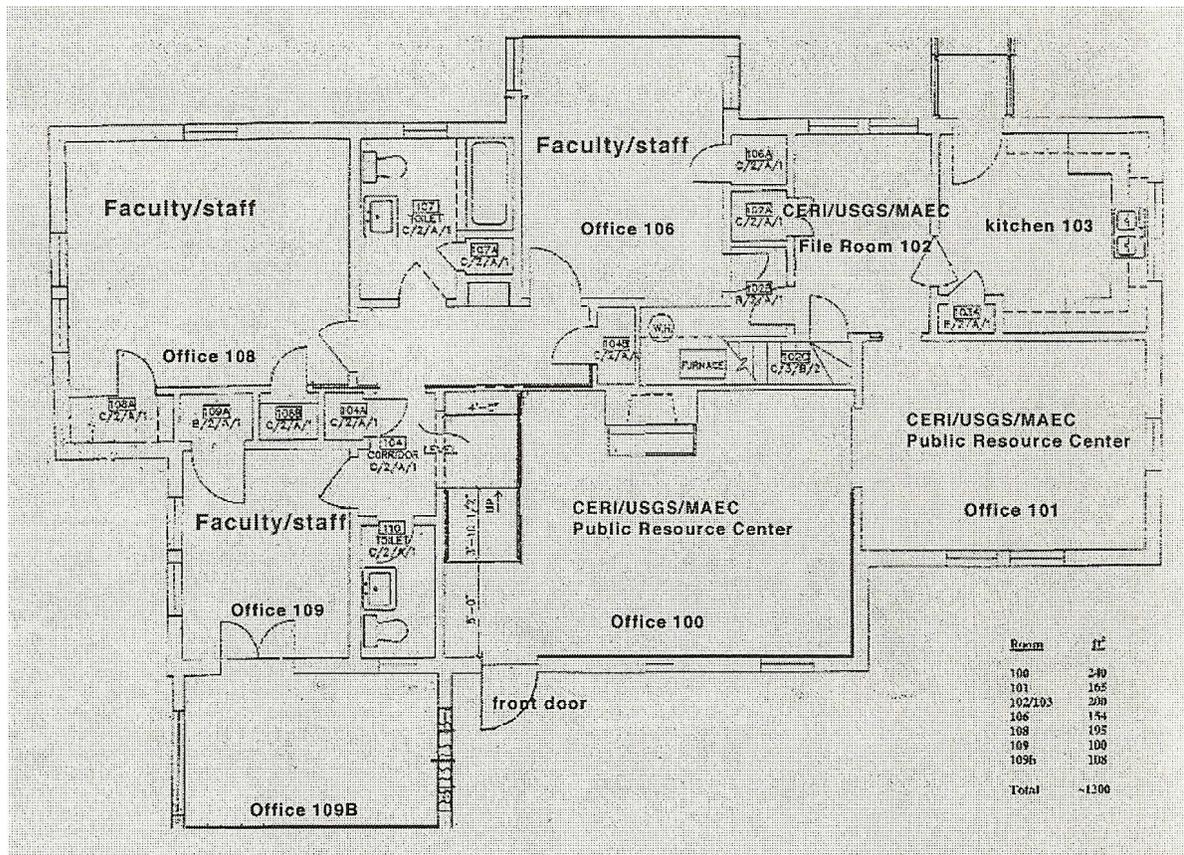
Floor plan for 3918 Central and projected space utilization plan for the PERC.
